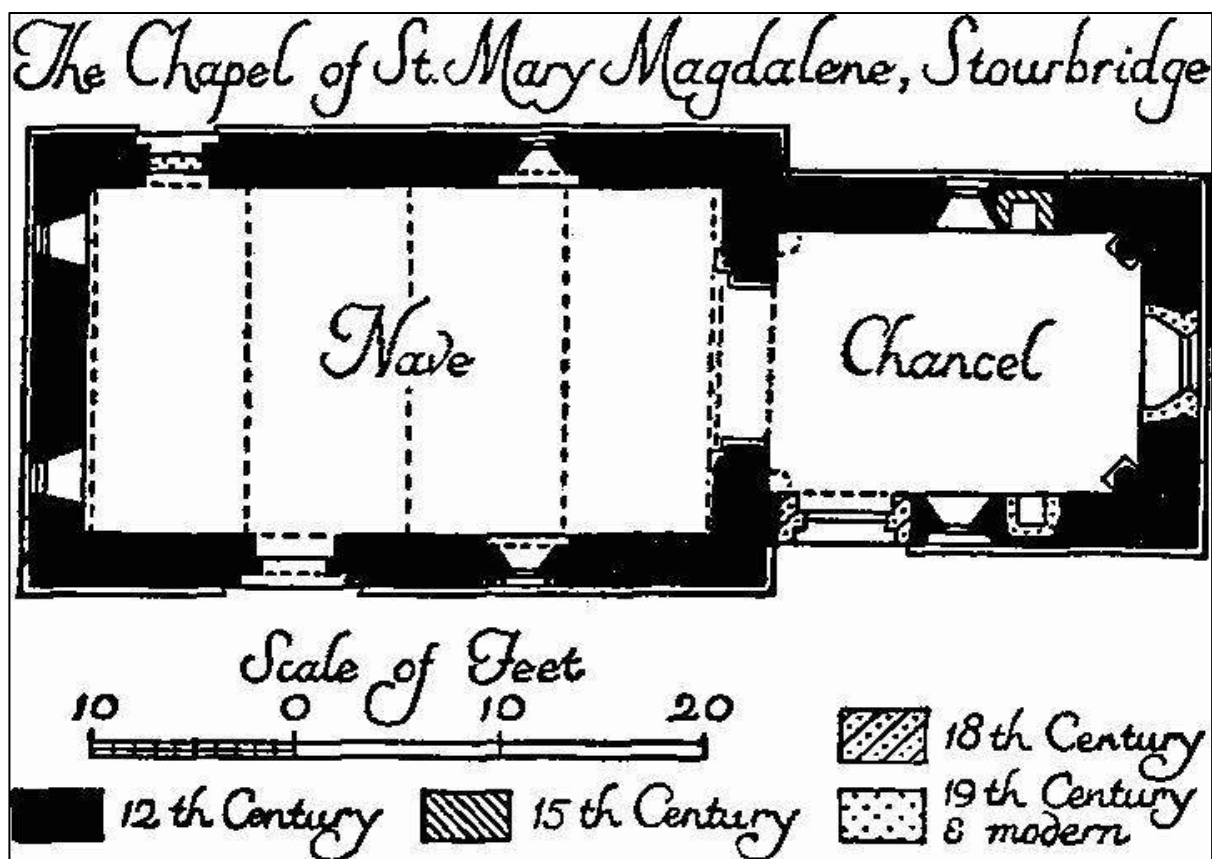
Drawing showing the floor plan of the Cambridge Leper Chapel and major modifications to the building since its construction in the 12th century (RCHM 1959).
